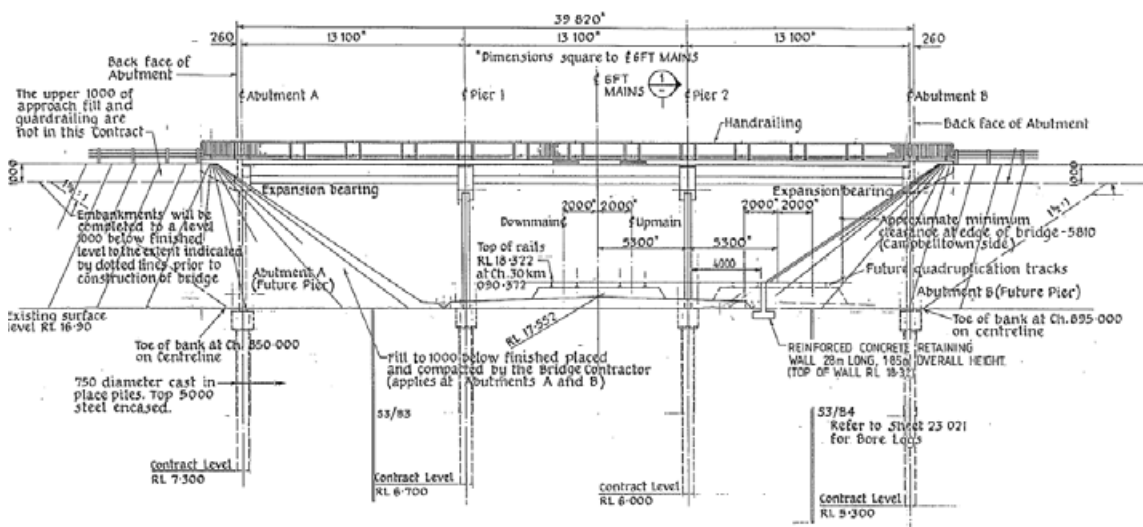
Moorebank Avenue Overbridge – Existing Configuration
